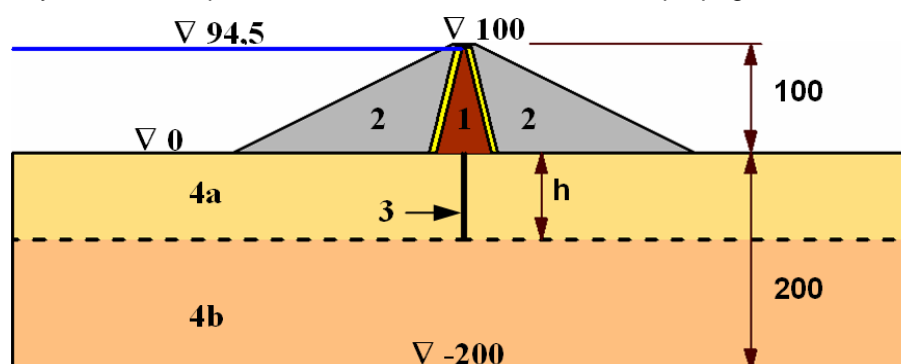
Design diagram of the wall in foundation of an embankment dam:
